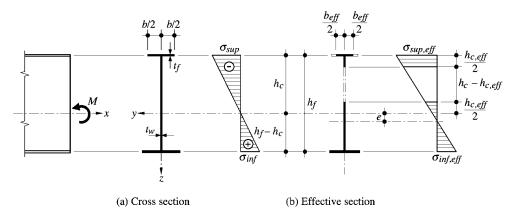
Effective section and distribution of stresses for a singly-symmetric plate girder in bending.
